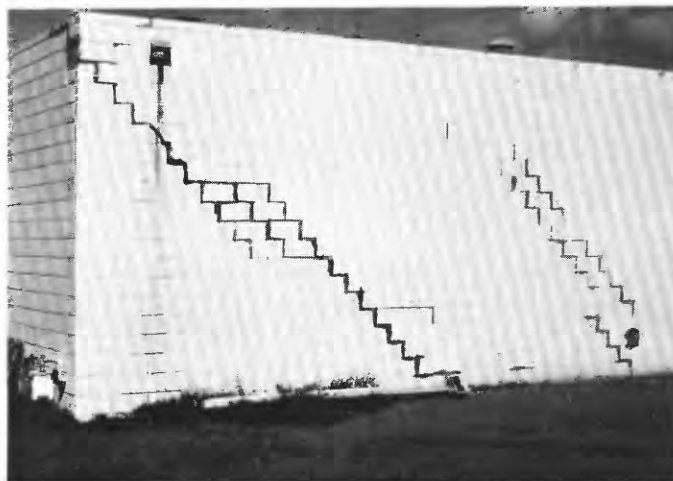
Building wall damaged by staircase corner fracturing, Lakewood, October 1976. The center section of the wall at right has been uplifted relative to the corner at left. Damage of this sort is frequently caused by expansive clay.
